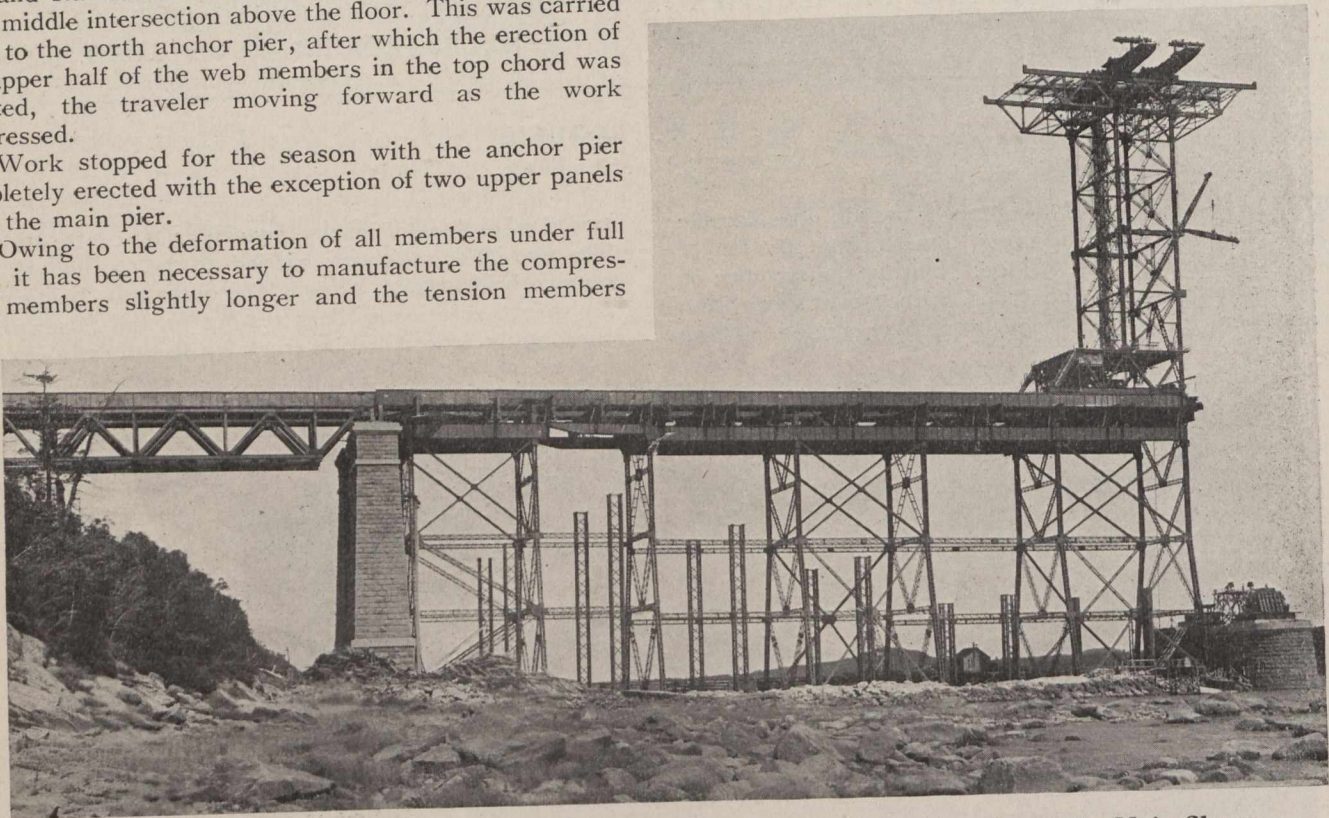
Falsework and Floor Erected, and a Start Being Made on the Erection of the Main Shoes.
